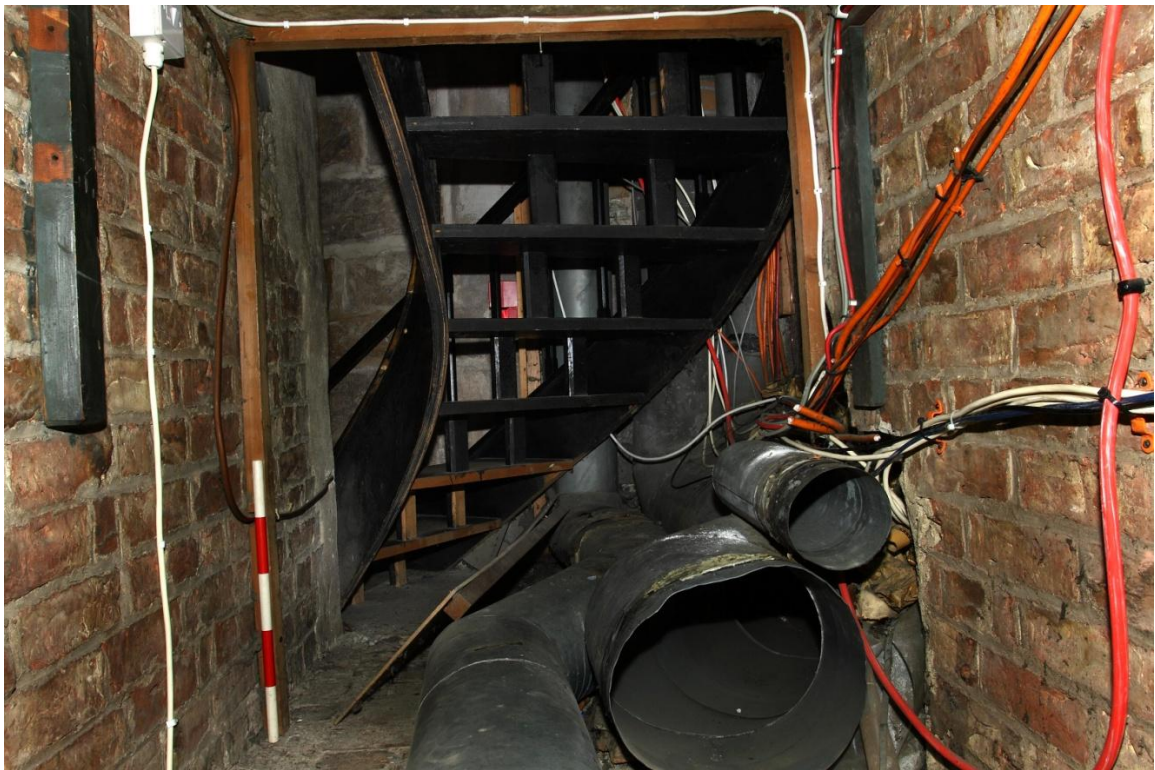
Arm of the 'T' shaped organ ducts, looking S
